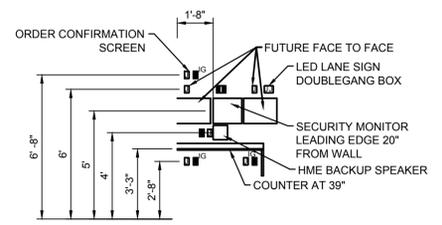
DETAIL SHOWN FOR COORDINATION/INFORMATION OF AREA INSIDE BUILDING.
